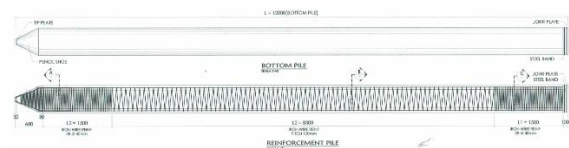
Bottom 12 m pile foundation (Source: Shop Drawing)
